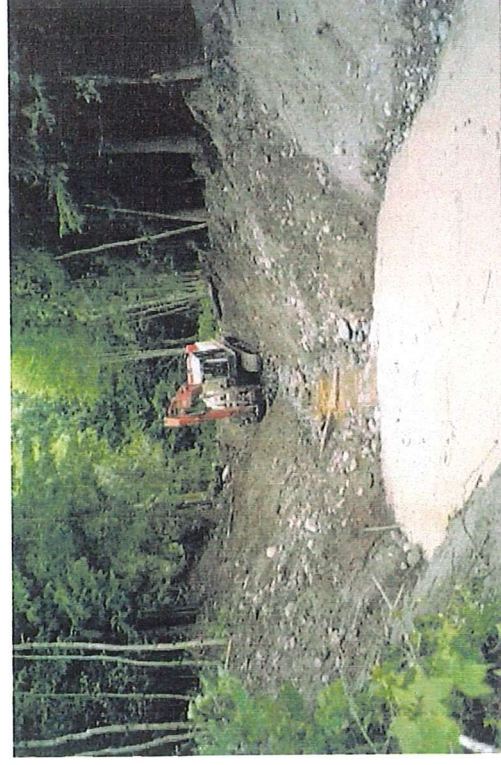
Copper River Off-channel Project. Lower section between pools 1 and 2 during excavation, looking upstream.
